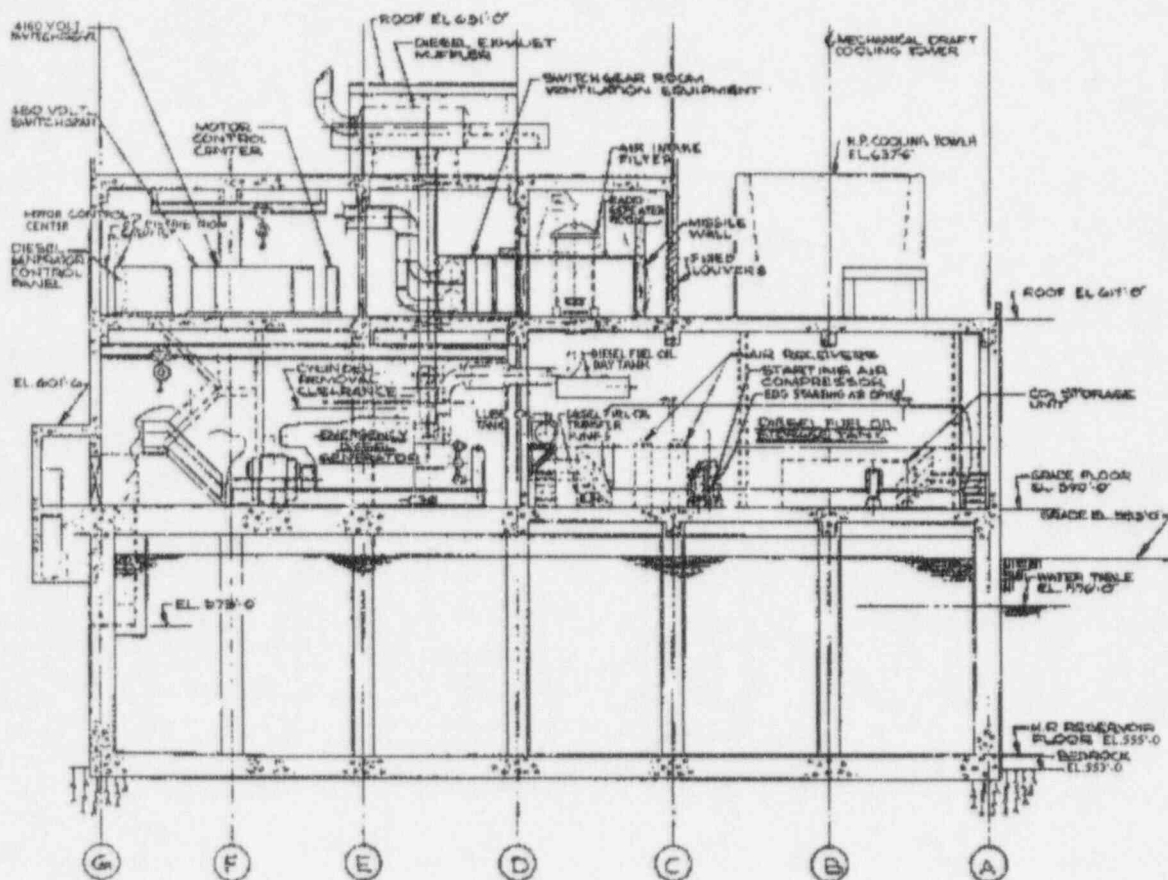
RHR Building Section Through EDG and Tank Rooms Looking South
